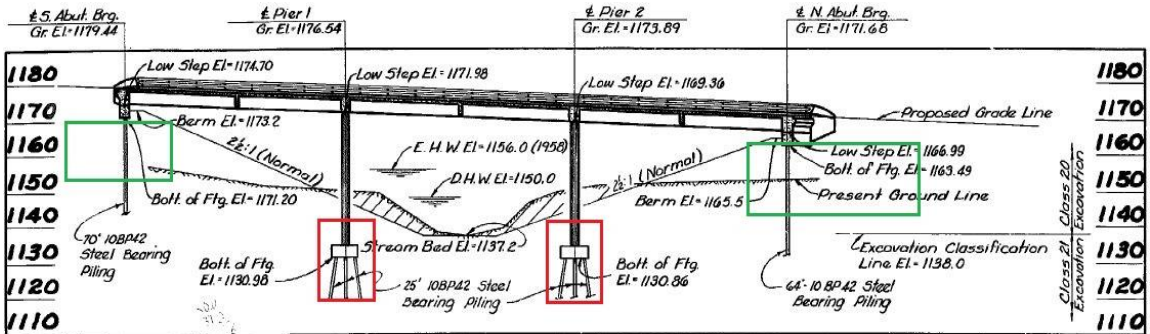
Longitudinal section of a bridge with unknown scour depth
